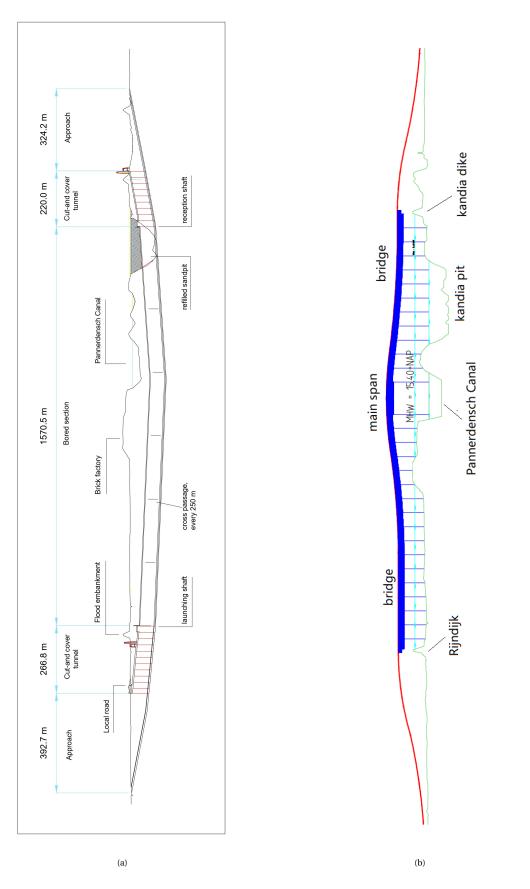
a) Longitudinal alignment of double-tube bored tunnels. b) Longitudinal alignment of bridge
